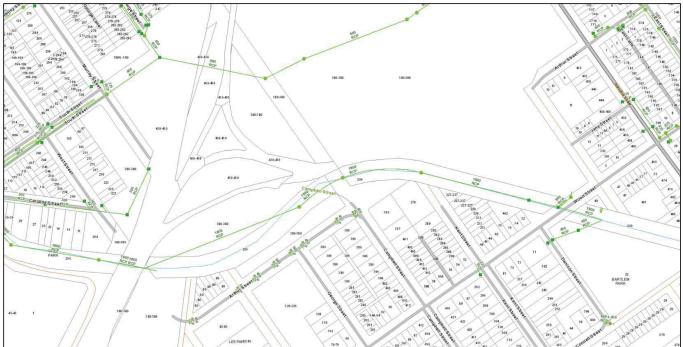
Local Stormwater Drainage Infrastructure (South)
